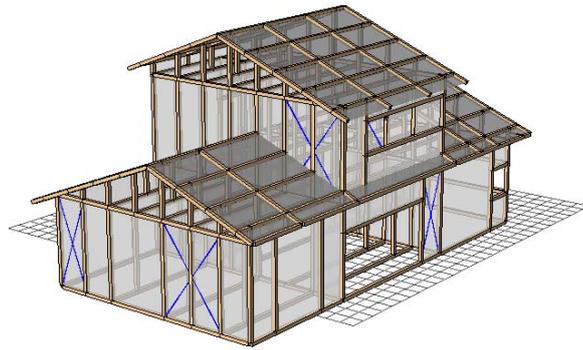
Analytical frame model for an old wooden house, W-house, built in 1961
